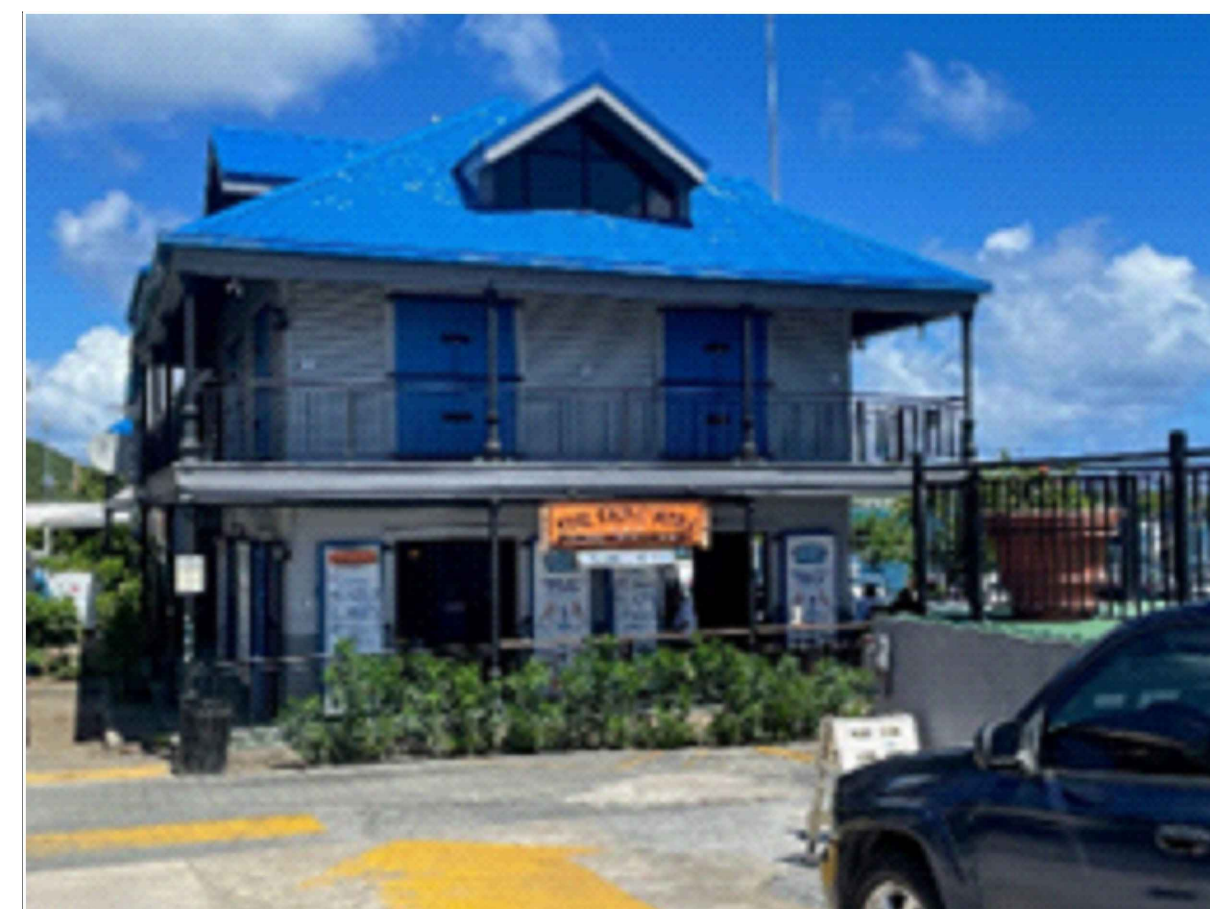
VIEW OF WEST FACADE - BUILDING A
